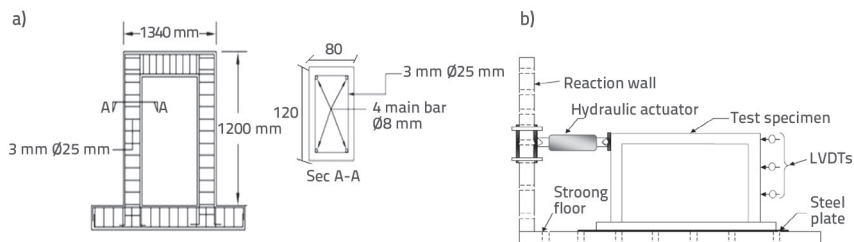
a) Reinforcement details of the lab model; b) loading setup of the lab model [15]
